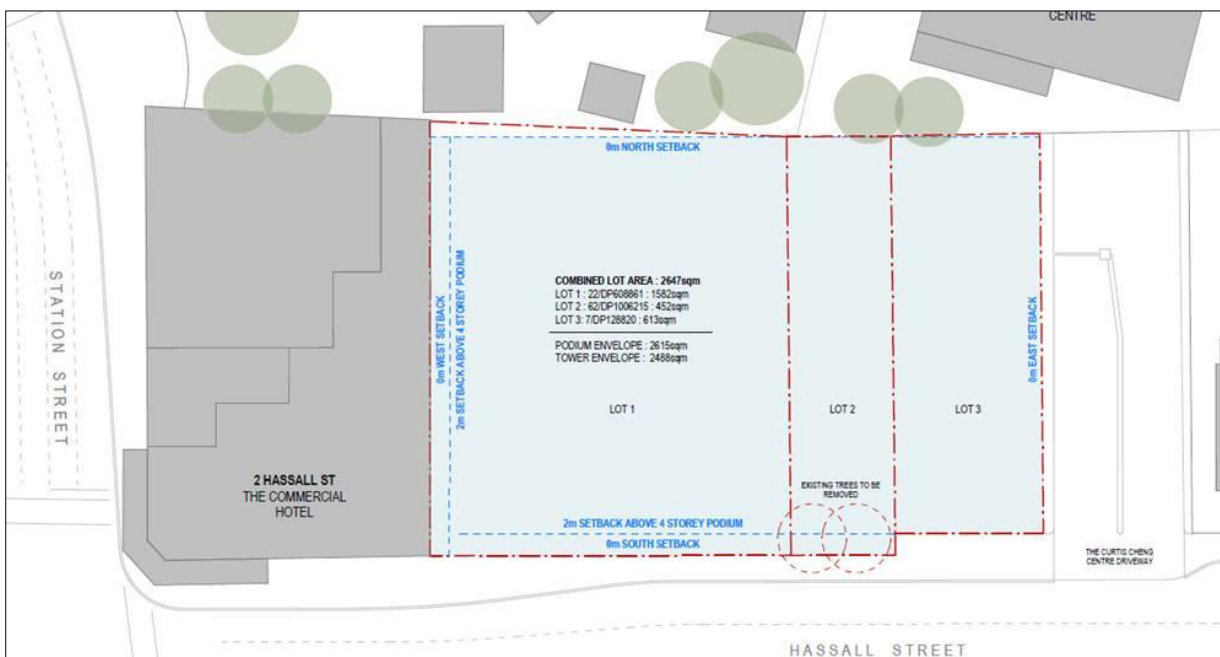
Concept plan of the proposed development, adjacent to the Commercial Hotel. Source: Planning Proposal, Architectus 18/12/2017.
